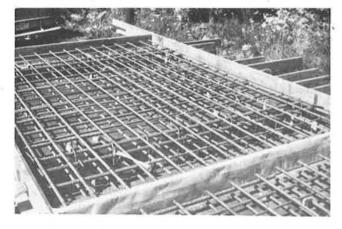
Slab reinforcement (deepened sections represent prestressed, precast concrete girders).
